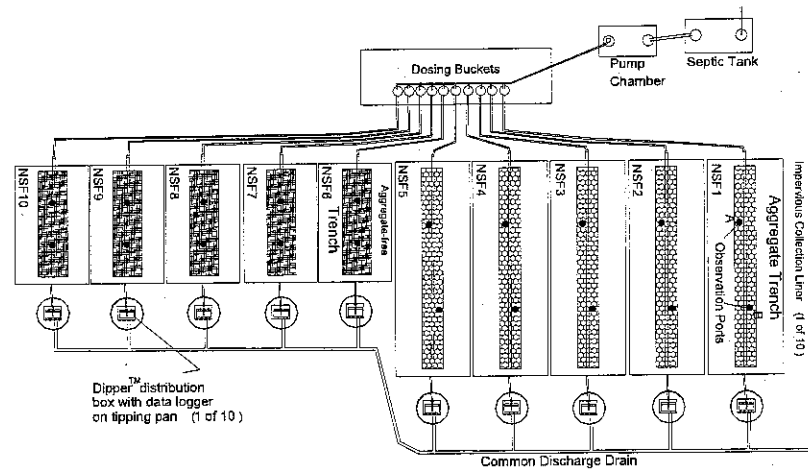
Layout of pilot protocol site for testing gravel-laden and gravelless trenches at the Massachusetts Alternative Septic System Test Center.
